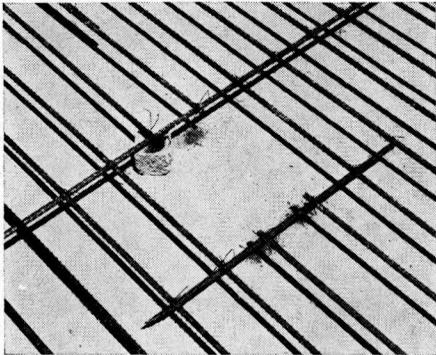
Open Space Left in Reinforcing Steel for Cutting Core
